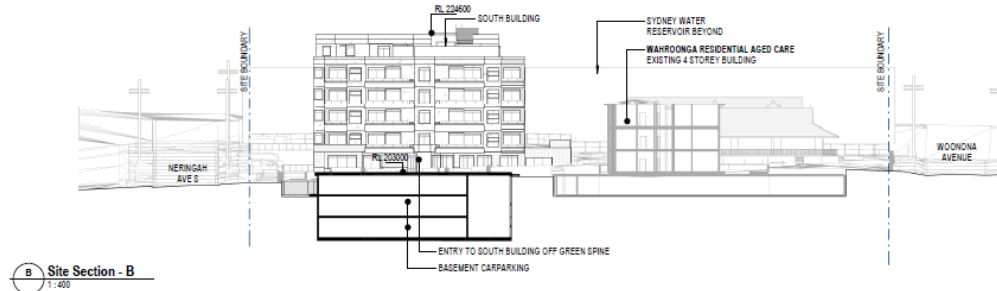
Proposed site section B. (Source: Bickerton Masters Architects)
